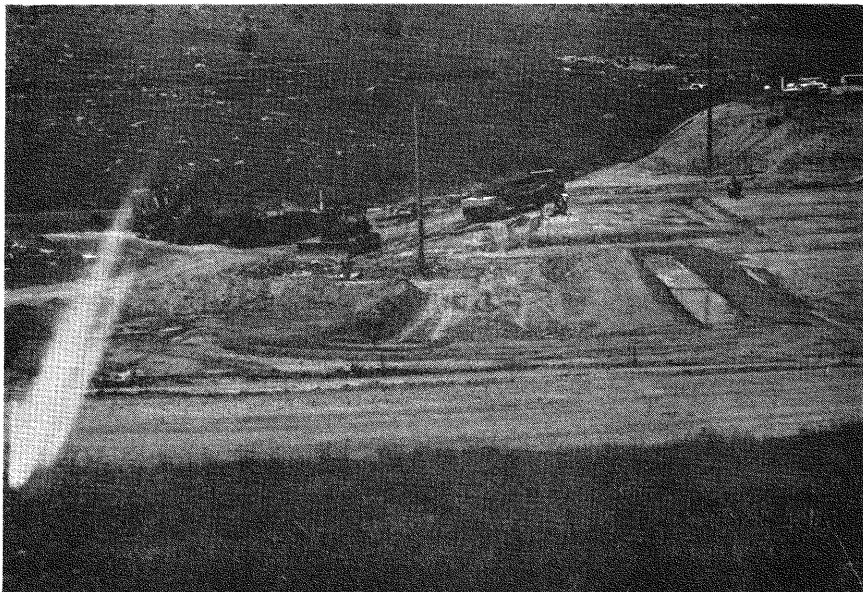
OVERALL LAYOUT OF RAINFALL FACILITY: Excavation for oil shale on right and holding pond for runoff water on left. Large tower in center used to mount floodlights for night work.
